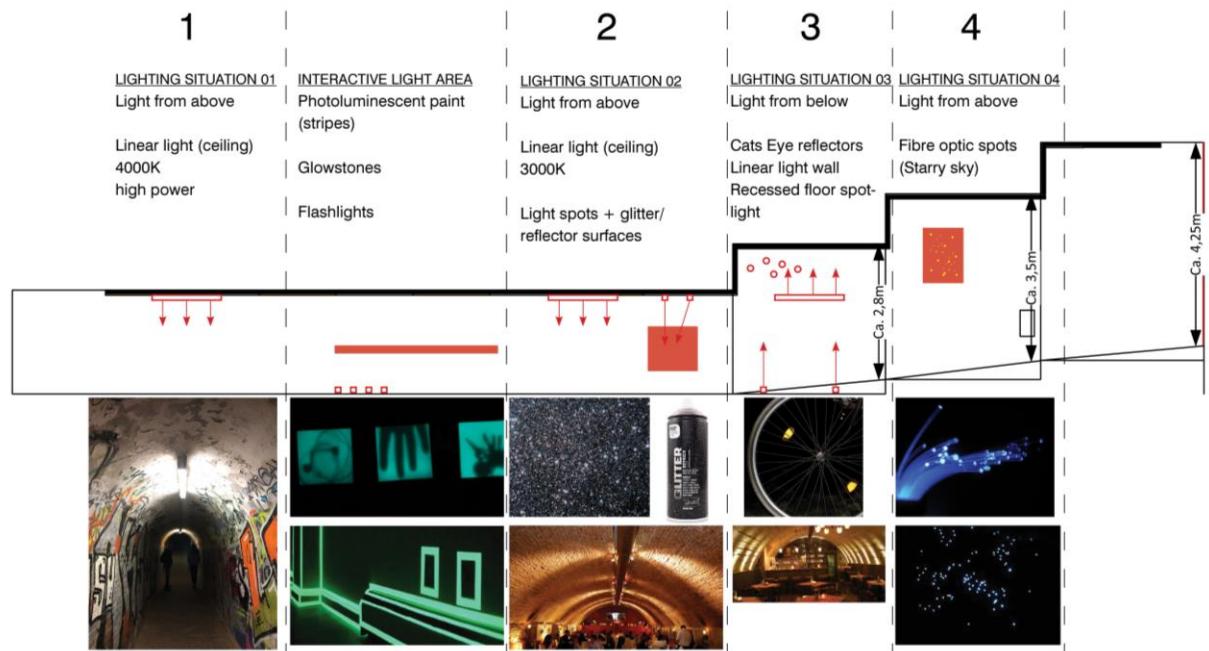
Setup lighting situations Elbschlosstunnel, UBL (see Appendix 3, p. 36)
